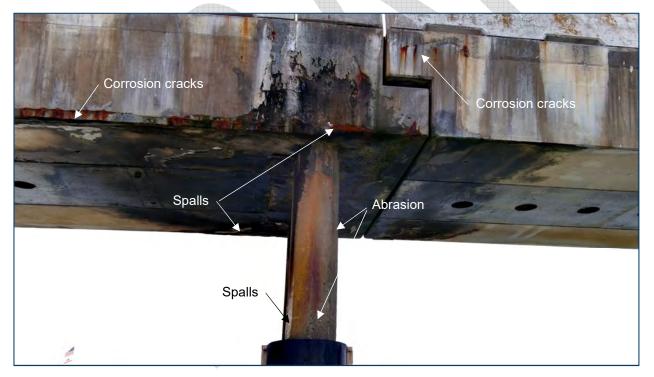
Deck Exterior at Bent 1B - North Face
